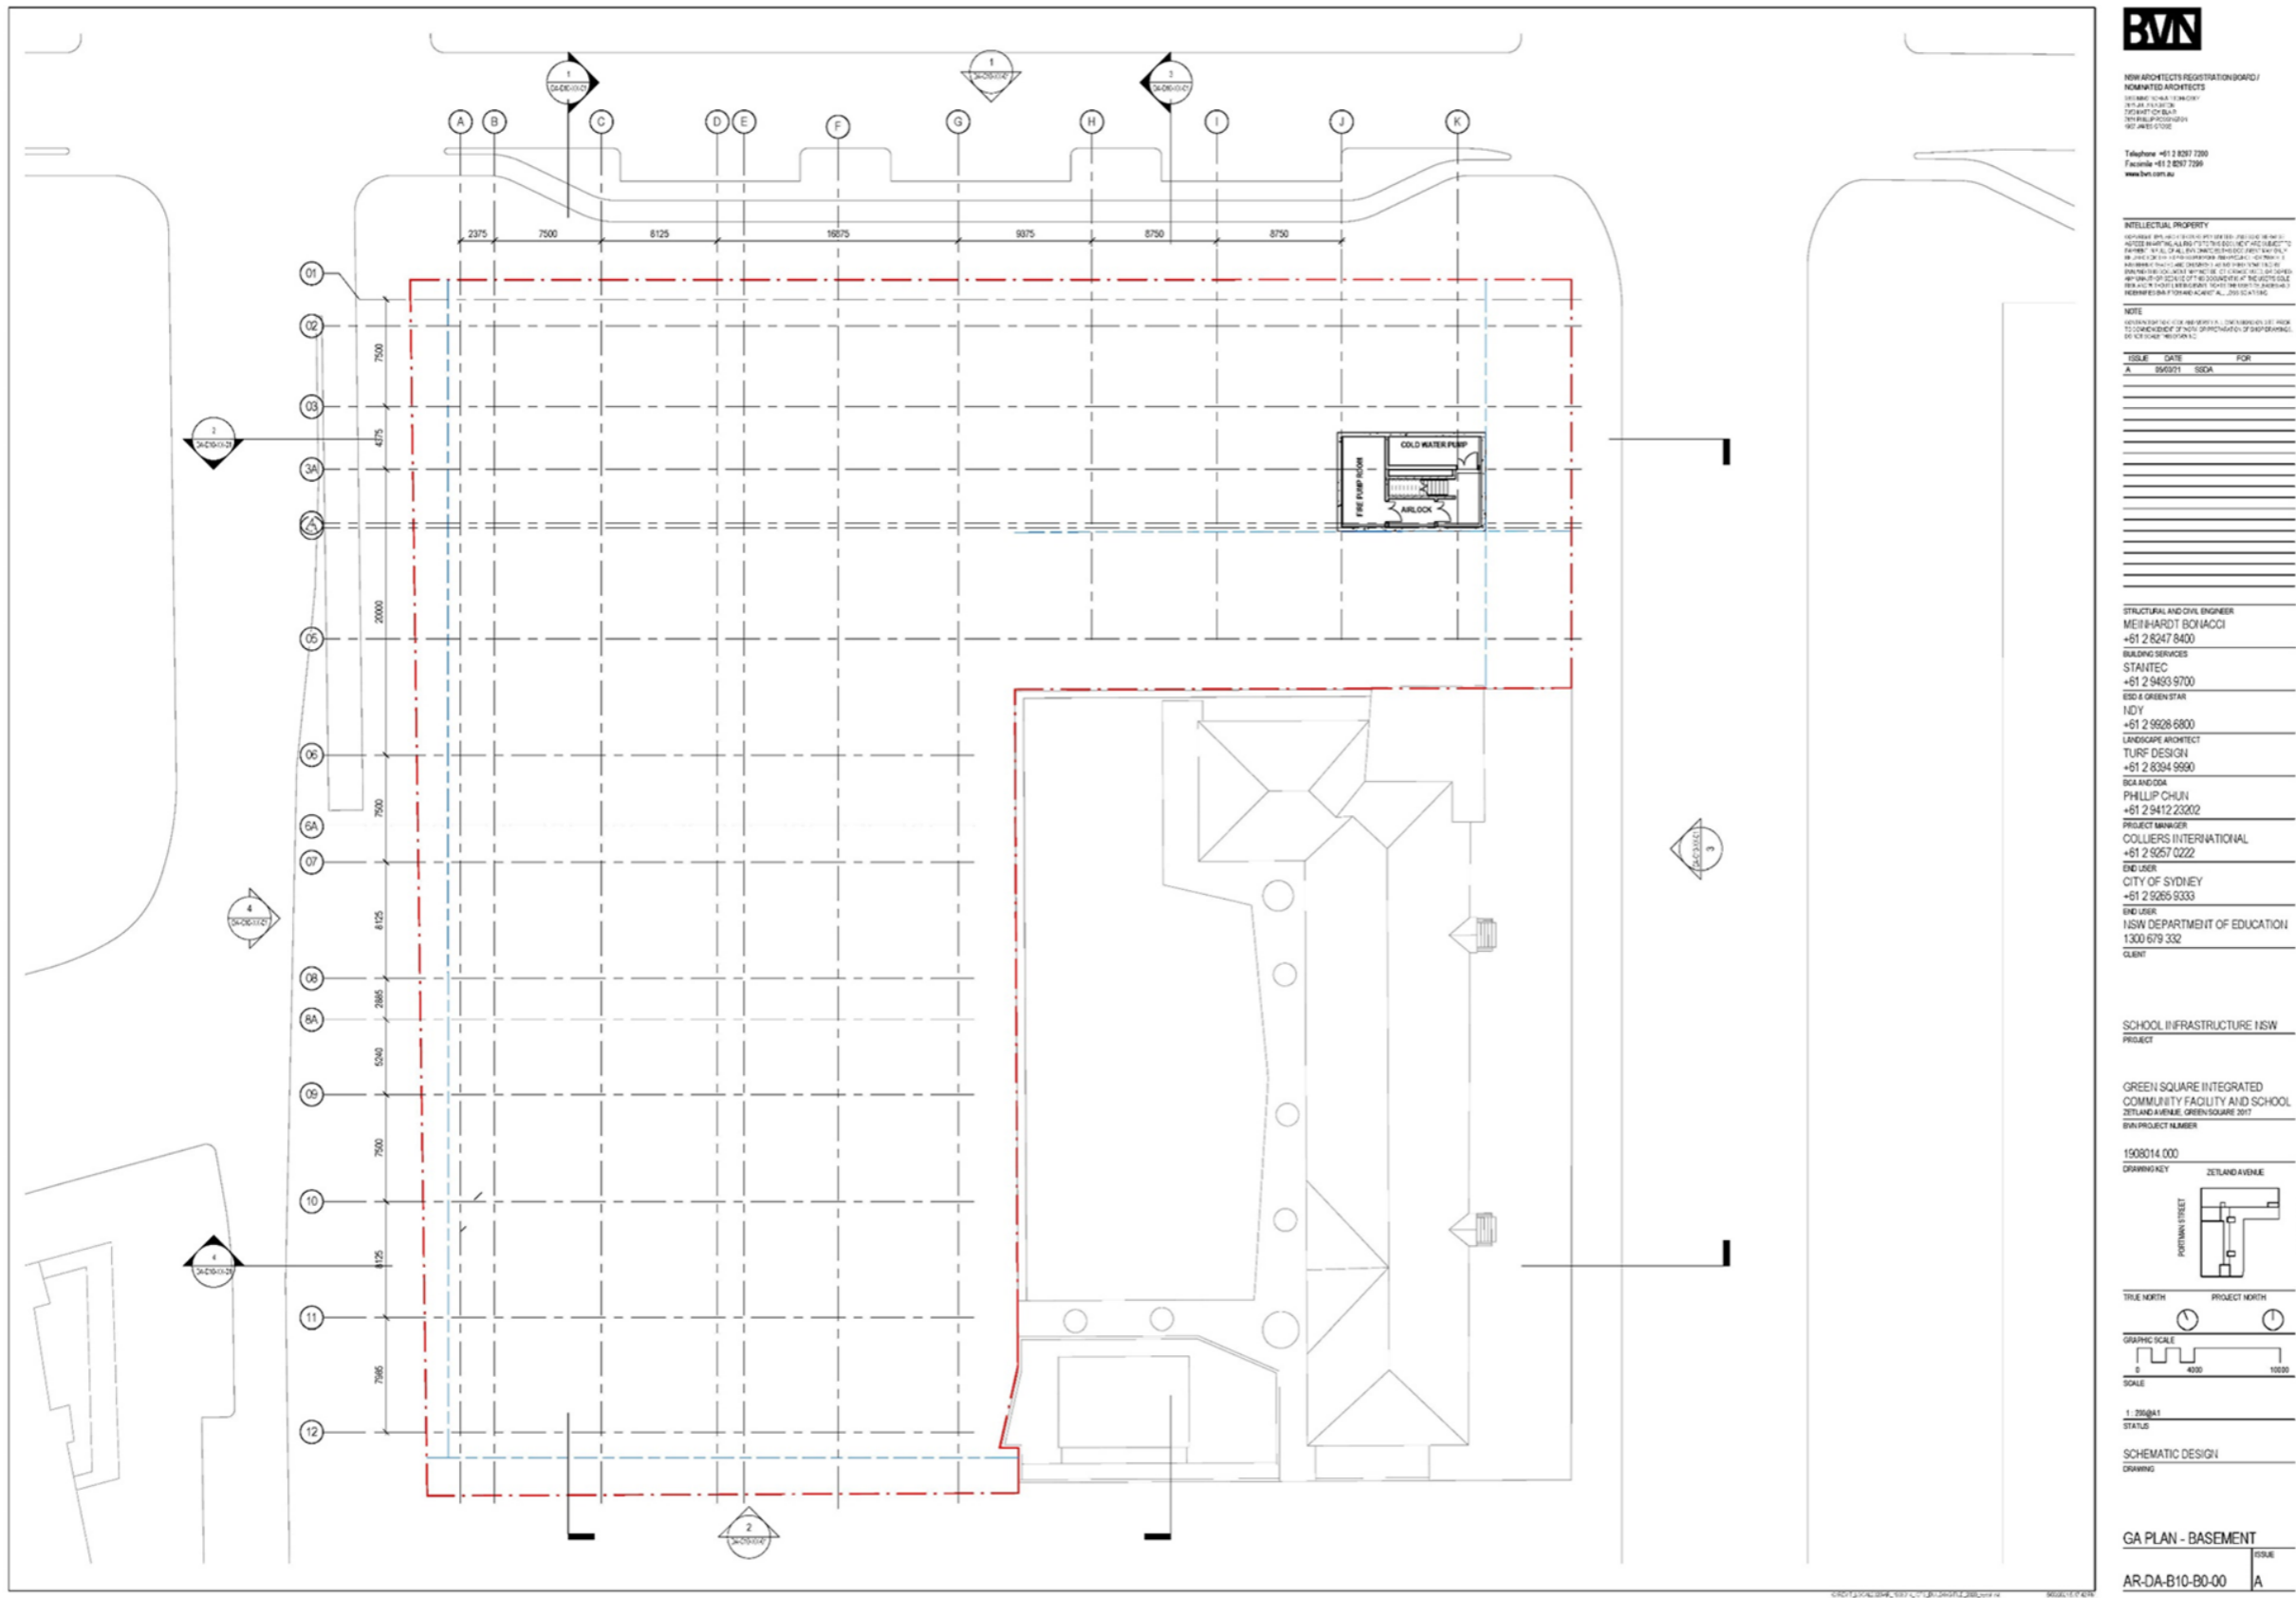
GA Plan - Basement. BUN Architecture Pty Ltd (2021). DA-B10-B0-00, issue A.
